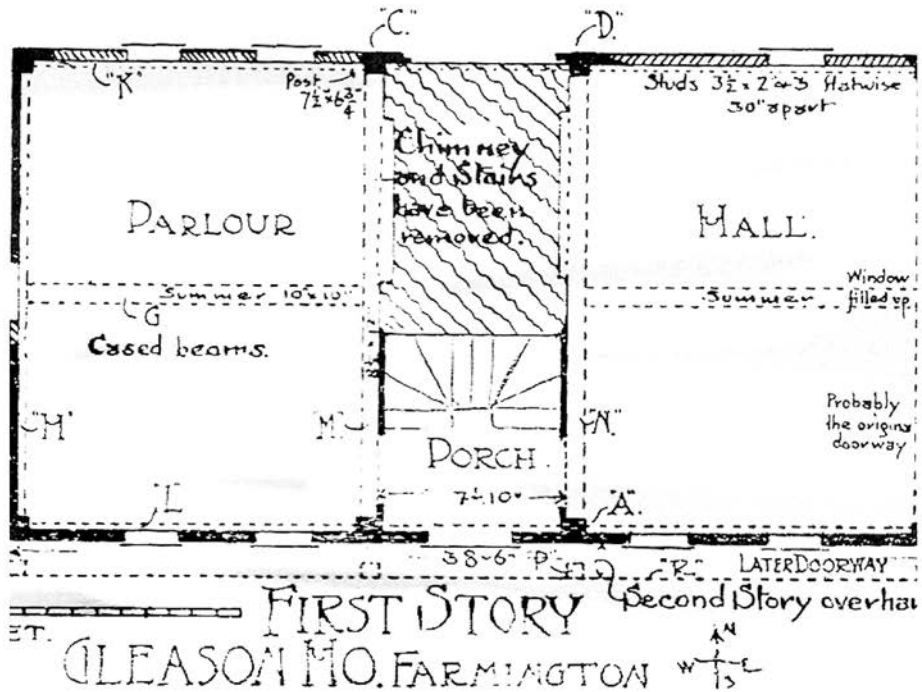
House c.1660, Farmington, Connecticut (Early Houses of Connecticut)
